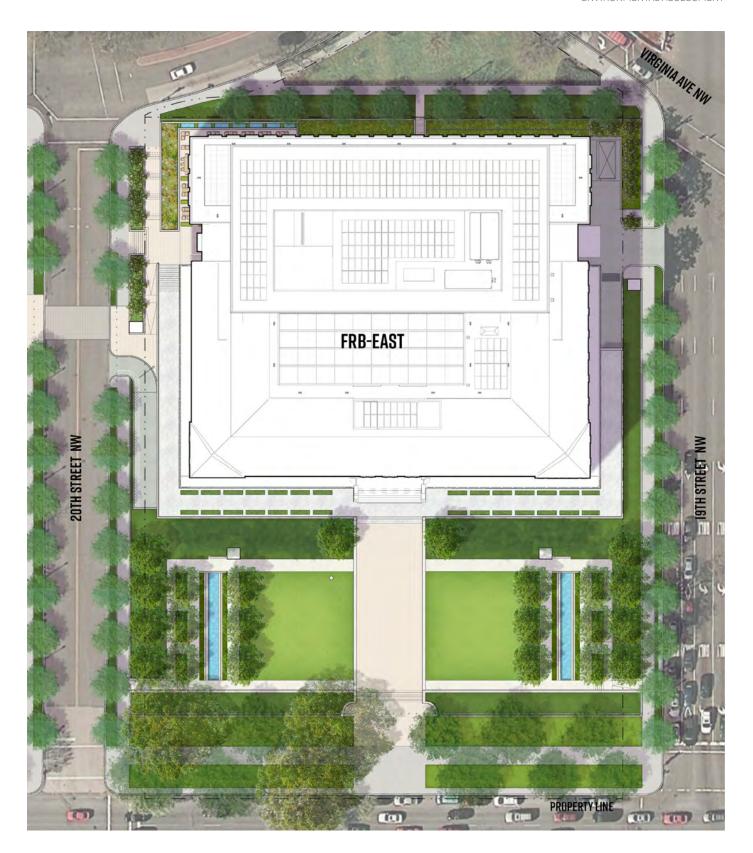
Alternative 2: Landscape Plan for the FRB-East Building (proposed).
